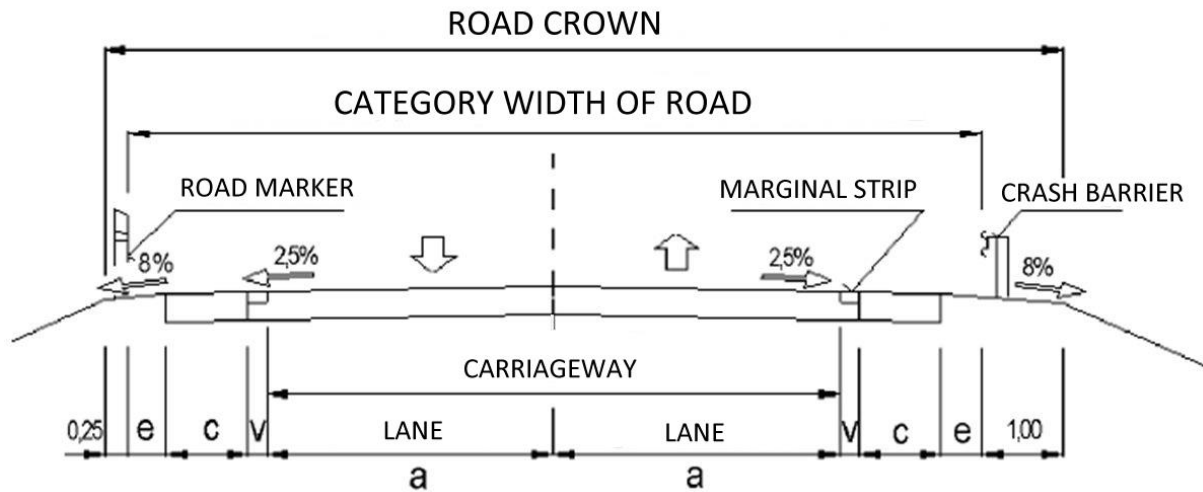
A cross-section of a directionally undivided road and its composite elements
